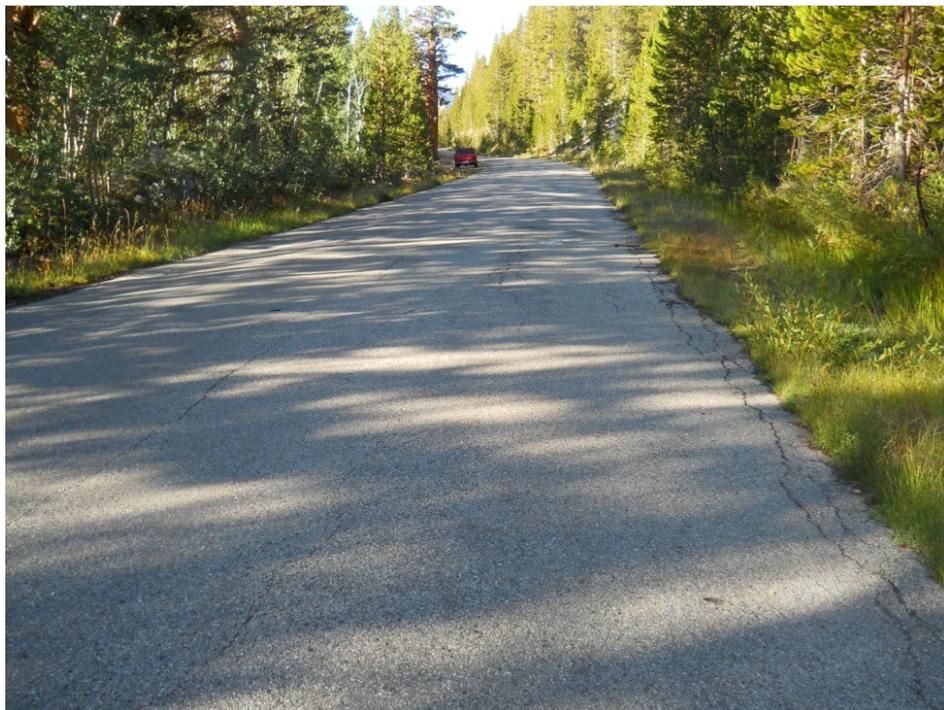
Sta. 1226 - Moderate to severe thermal cracking and patched edge on half of pavement also slight rutting based on snowplow damage to chip seal coat.
